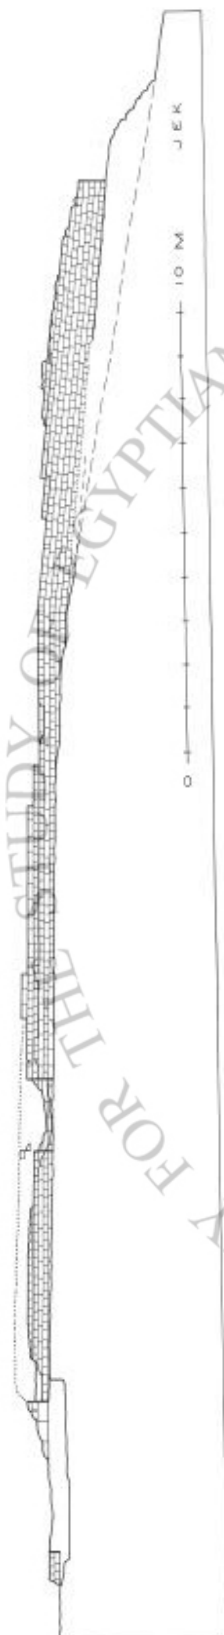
View of the North Stairs in the Approach Passage, N Wall.
